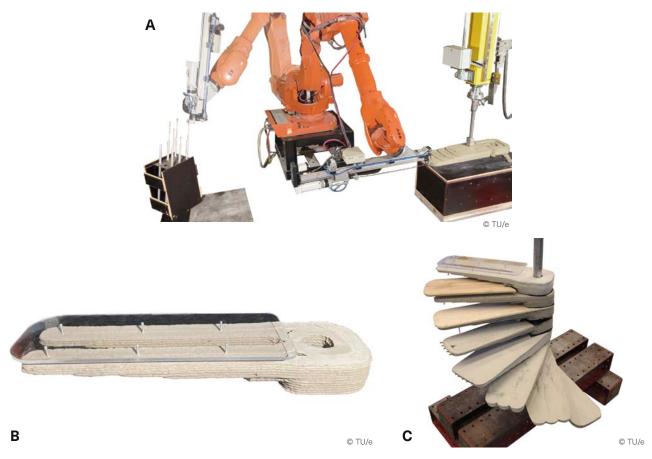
Using a second robot to insert reinforcement or screws into a printed element [H1].
